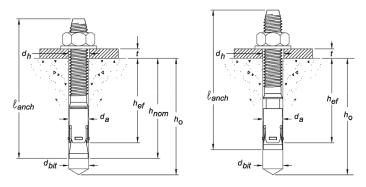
POWER-STUD+ SD1 ANCHOR DETAIL
